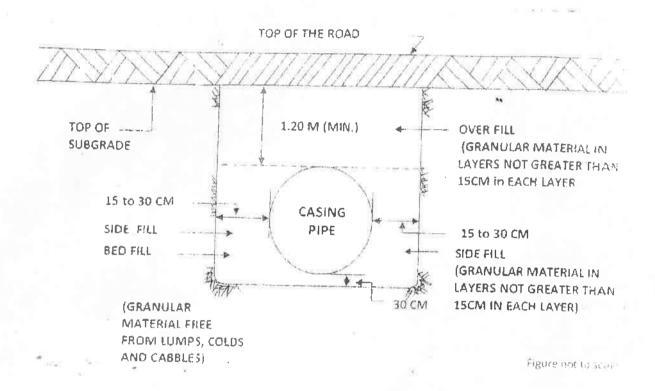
INSTALLATION OF CASING PIPE FOR CROSSING THE ROAD
